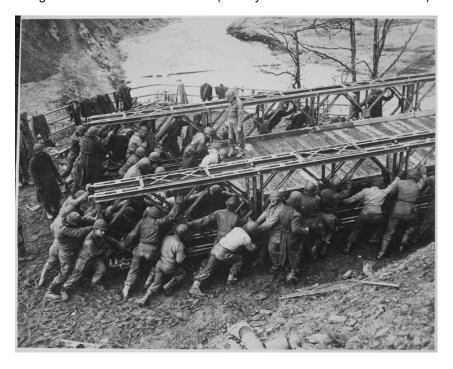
American engineers erecting a Bailey Truss Bridge during the Second World War (United States National Archives 2021)
